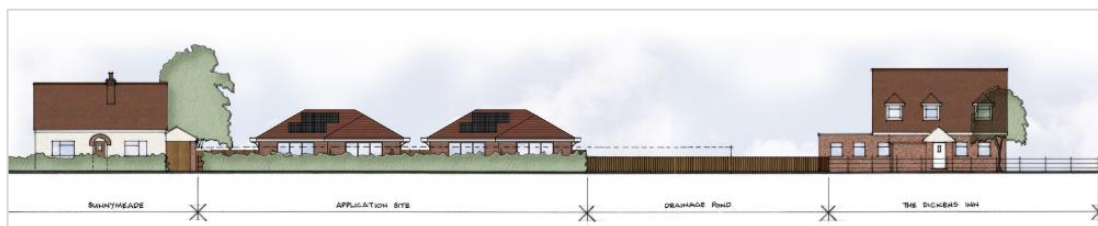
PROPOSED STREET ELEVATION (DRAWING NO. 23.53-PL07)
